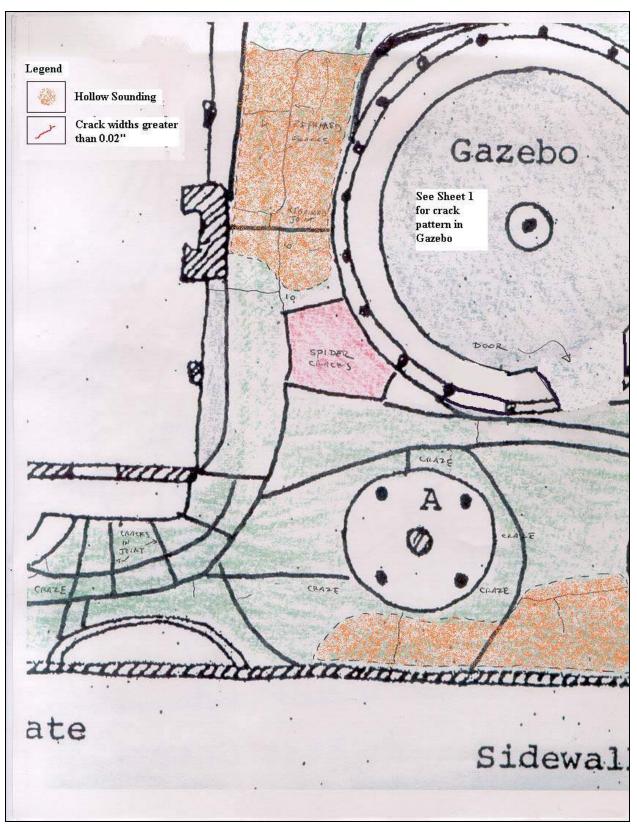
Section D -- Westerly center section (Gazebo and Tower A)
